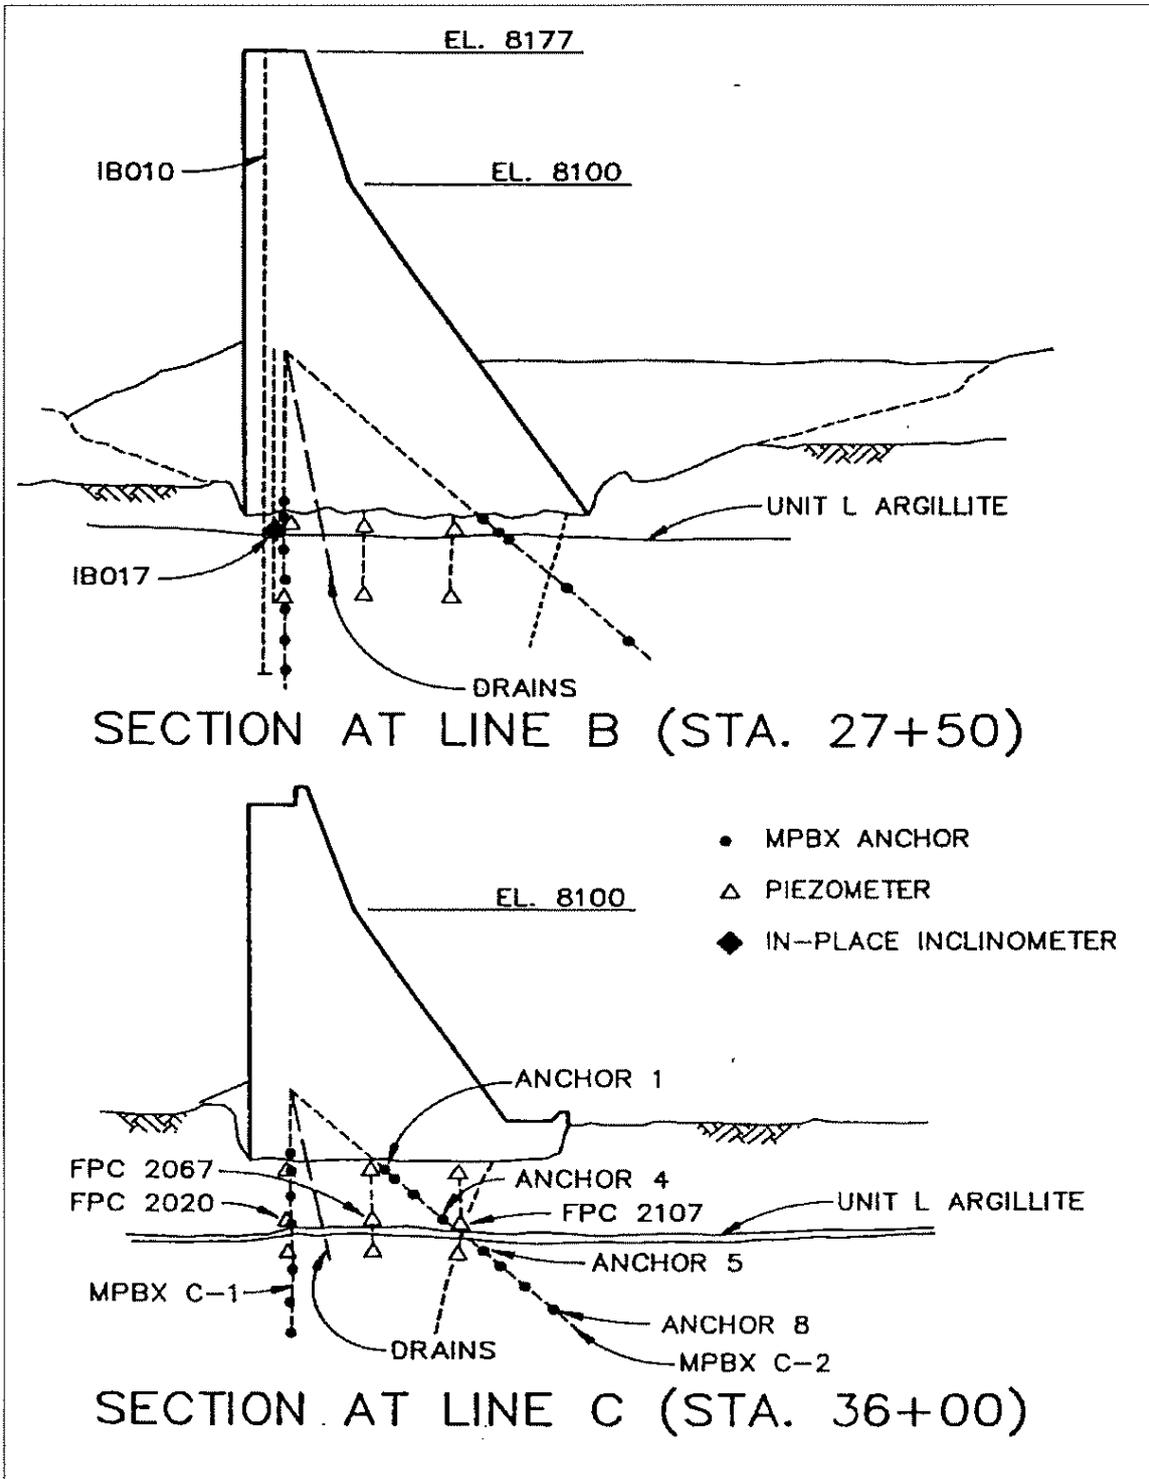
Sections through instrument locations at Upper Stillwater Dam
